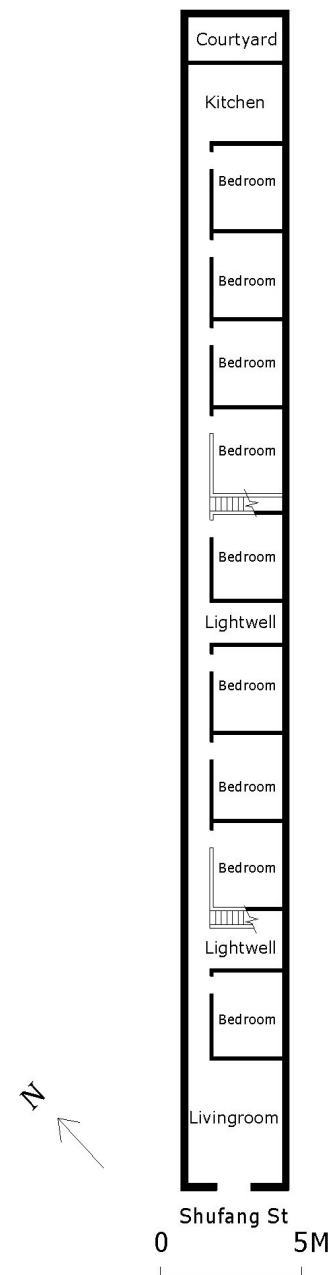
Ground-floor plan of a *zhutongwu* house in Guangzhou. Based on author's field survey.
